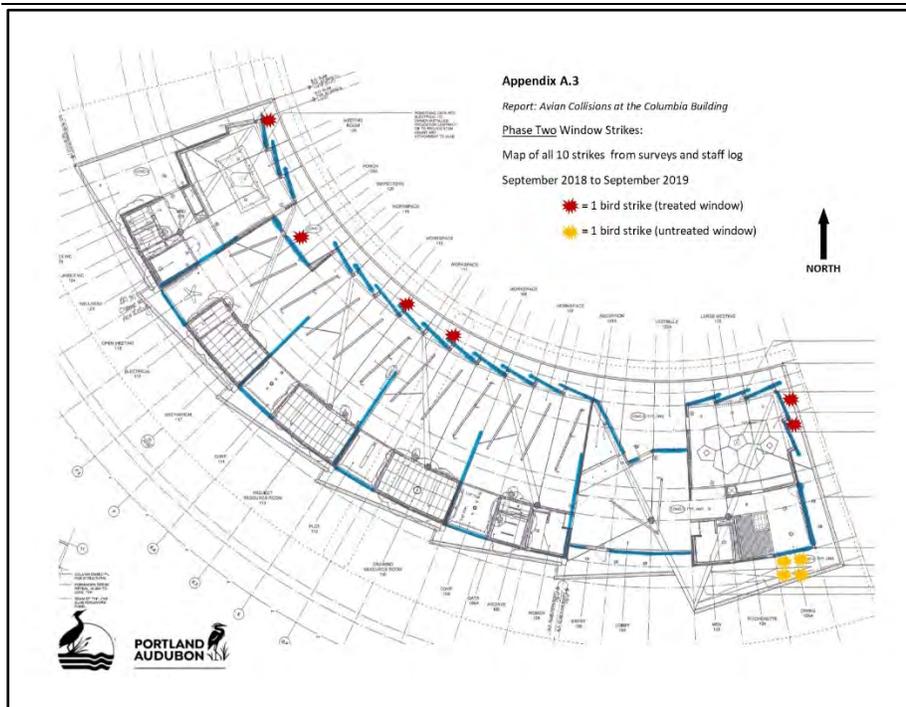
Plan view map of phase two window collision locations on the Columbia Building. Collisions on un-treated windows shown in yellow.
